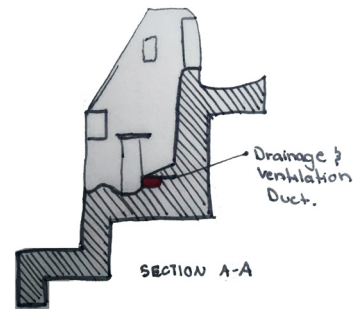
The drawing shows a cross-section of a wall structure, highlighting drainage and ventilation canals. Drawn and annotated by the author, based on Jean-Pierre Protzen (2005, fig 5.5).
